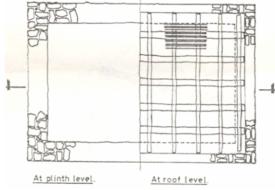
Plan of adobe or stone wall construction (After Dr. Tariq Rafey)
